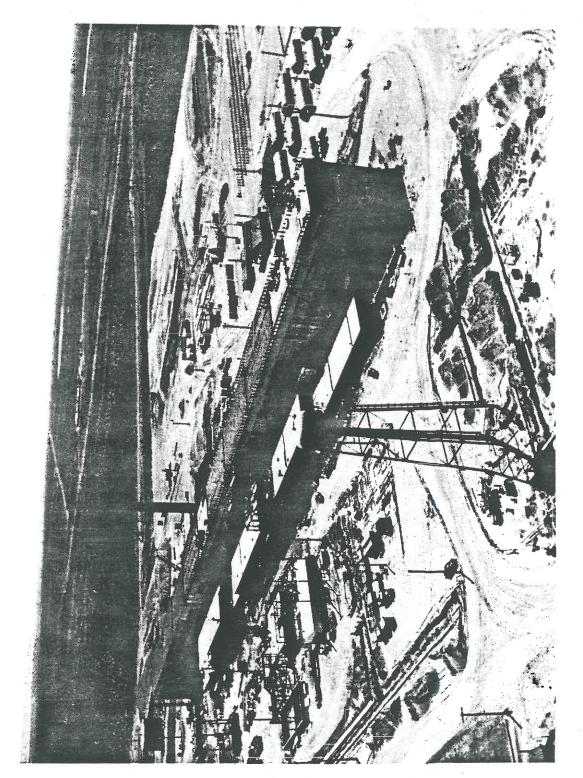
Aerial view of the PUREX Plant under construction showing the temporary construction buildings and huts, May 1954.
